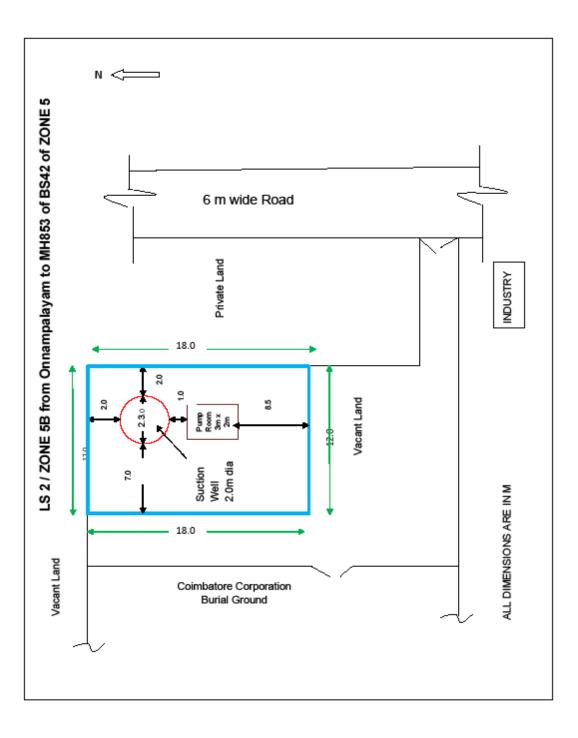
Site Set out Plans – Zone V (Onnampalayam)
